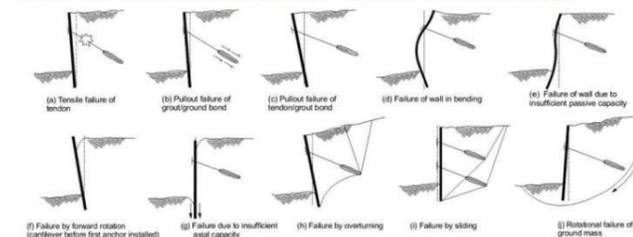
Possible modes of failure for tied-back retaining walls (Source: Sabatini et al, 1999)
